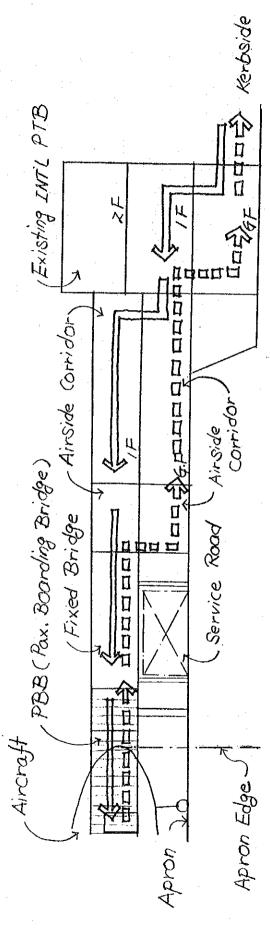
Departing and Arriving Passenger Flows, Floor Plan
